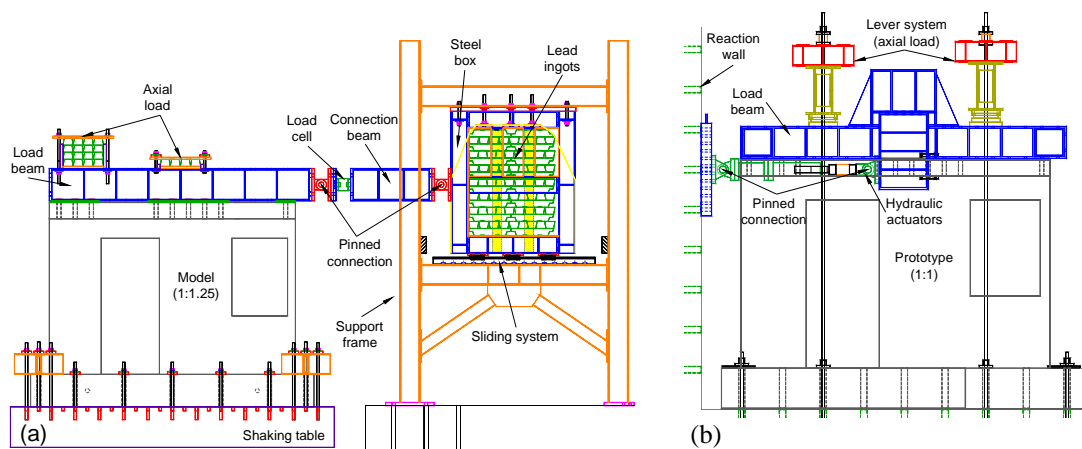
Test setups: a) Shaking table testing, b) QSC testing.
